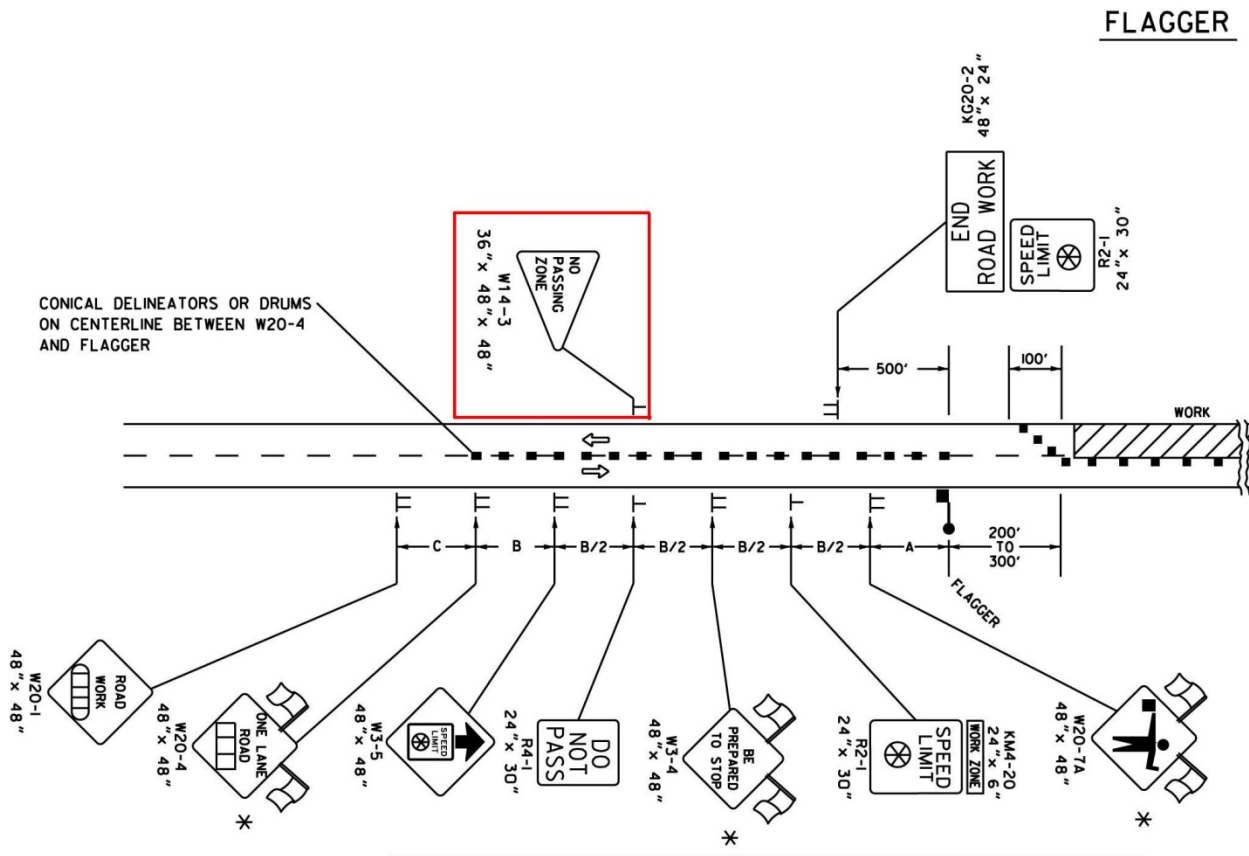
Schematic of work zone with missing sign at US-73 marked out.
